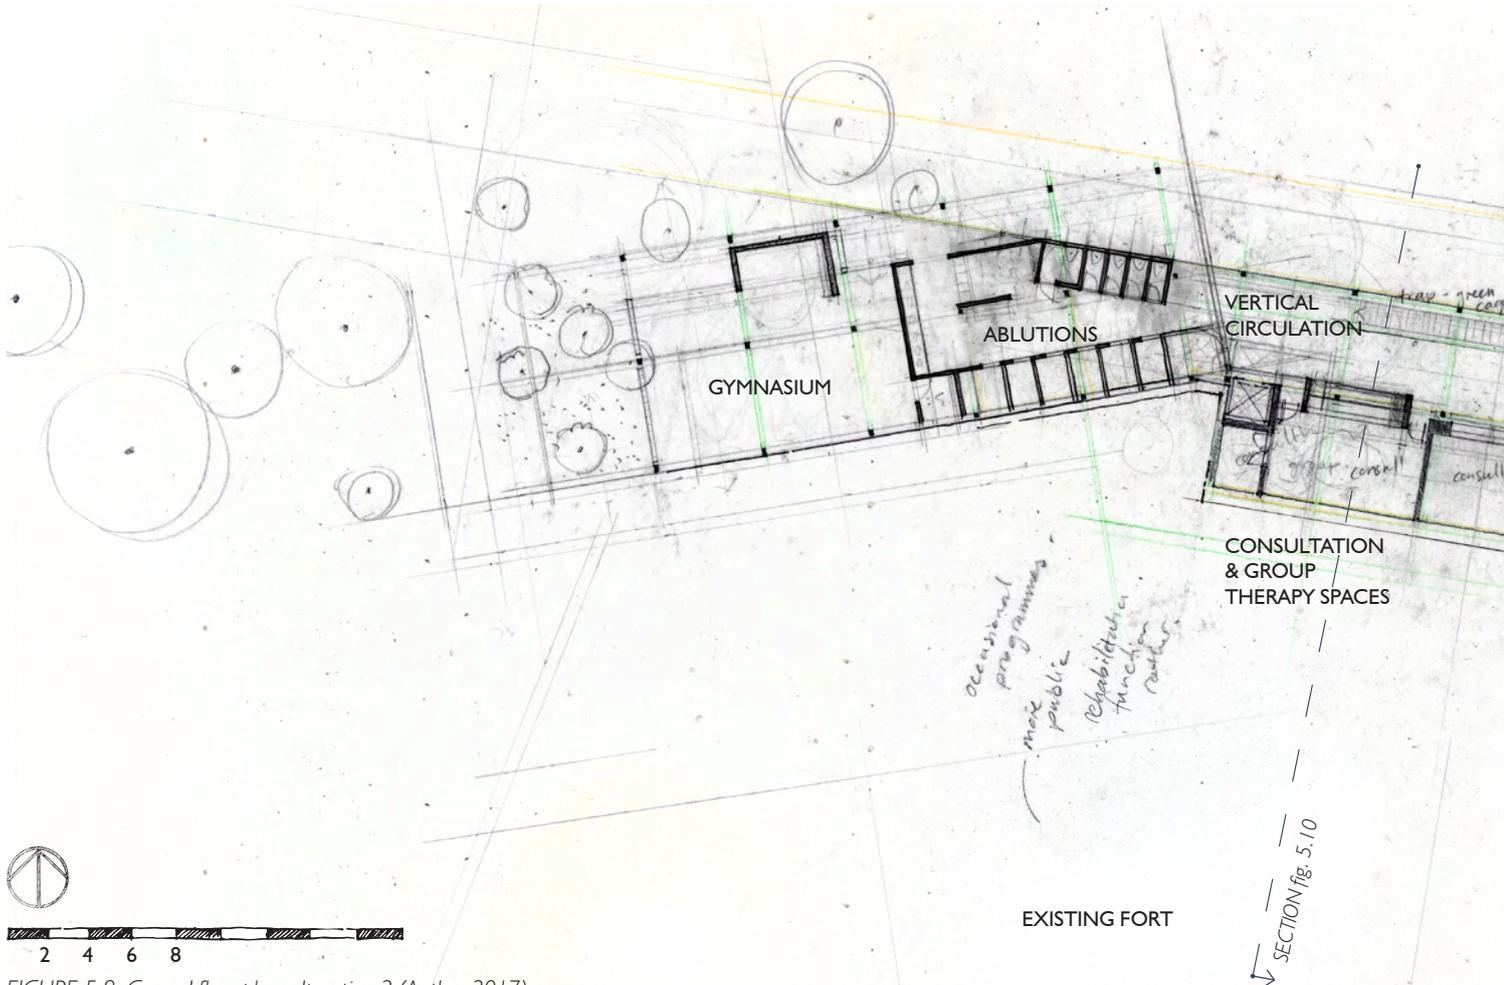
Ground floor plan - Iteration 2 (Author 2017)
